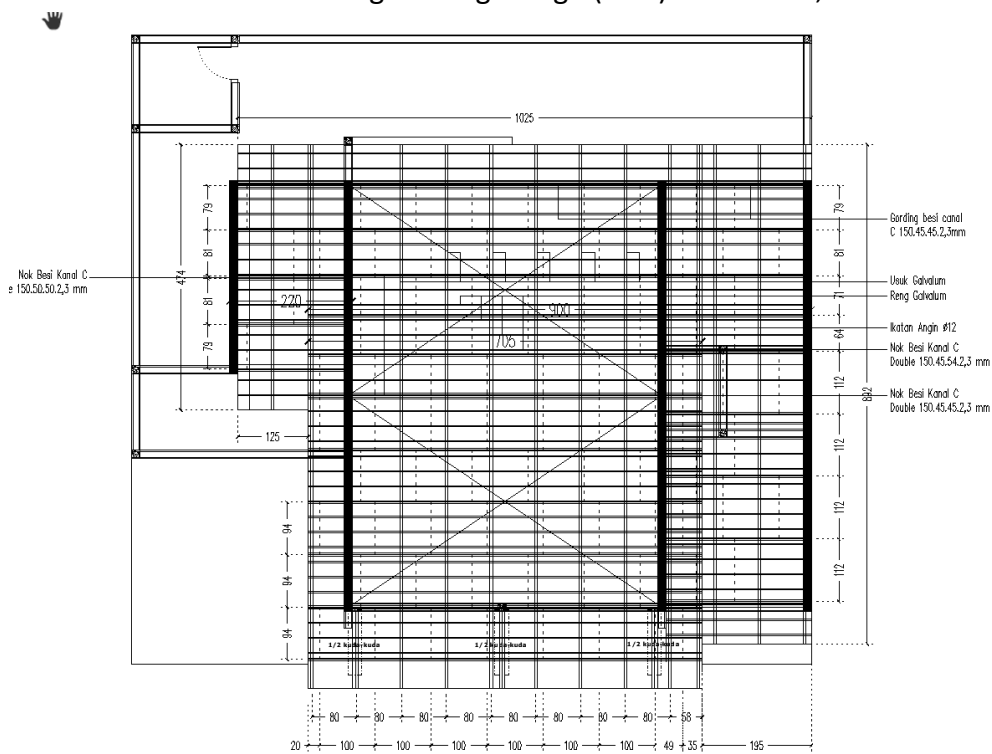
Roof Structure Plan of Official Residence, Jl. Mojoklanggru Lor
